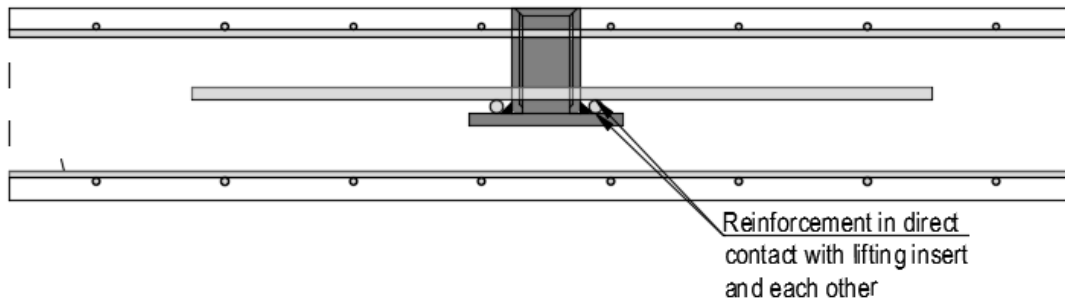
Placing of RPAS plate lifting insert socket anchor reinforcement
